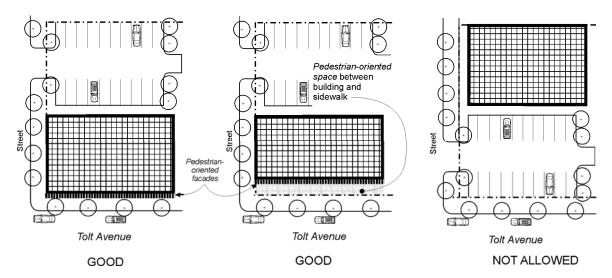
Building location and orientation standards for Tolt Avenue properties between Rutherford and Eugene Streets.
